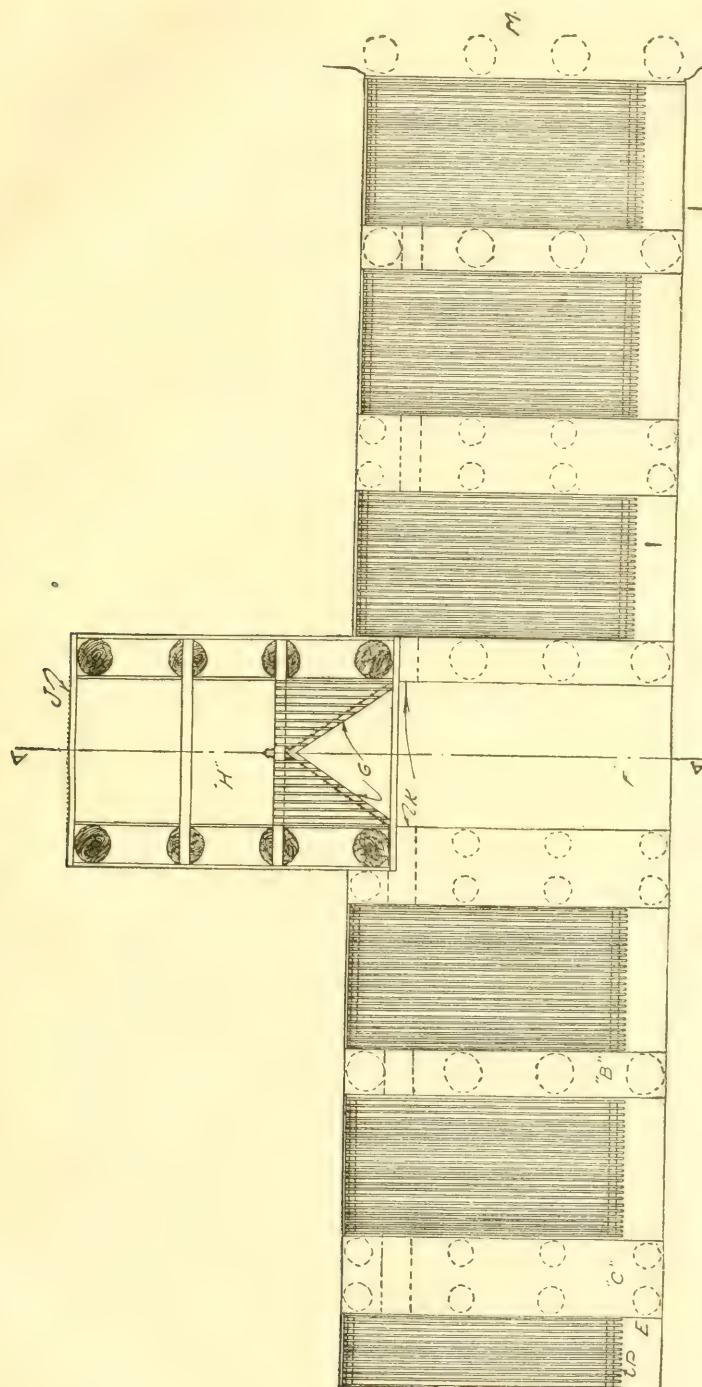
Plan of barricade in Phimney Creek, near Birdsview, Wash.: *B*, and *C*, single and double rows of piles, respectively; *D*, downstream end of ricks; *E*, floor under ricks; *F*, open channel to trap; *G*, walls of V-shaped approach to trap; *H*, trap; *J*, screen at head of trap; *K*, openings in pier for passage of fish to *G*; *L*, (fig. 3), door in north side of V-shaped approach; *M*, abutments.
